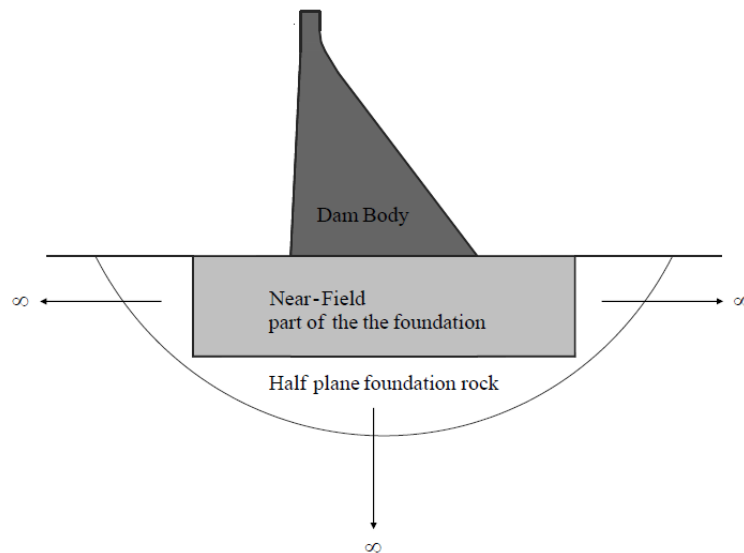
A typical dam-foundation rock system containing the dam body, the near-field part of the foundation, the semi-infinite foundation rock
